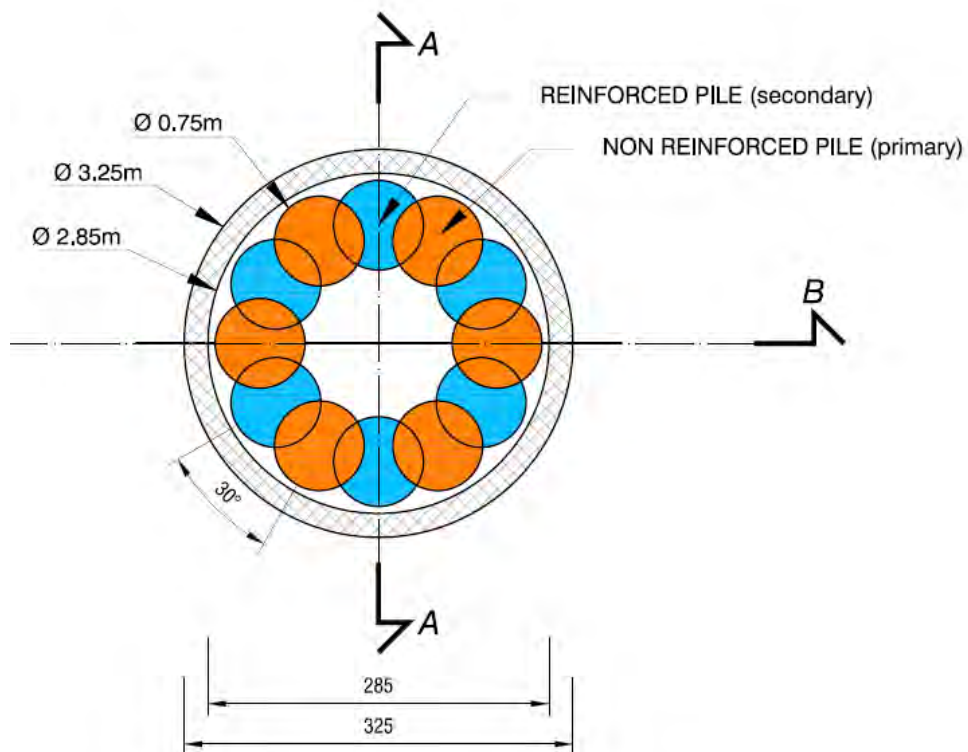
Horizontal section of the annular monoblock foundation at the level protected by precast caissons
